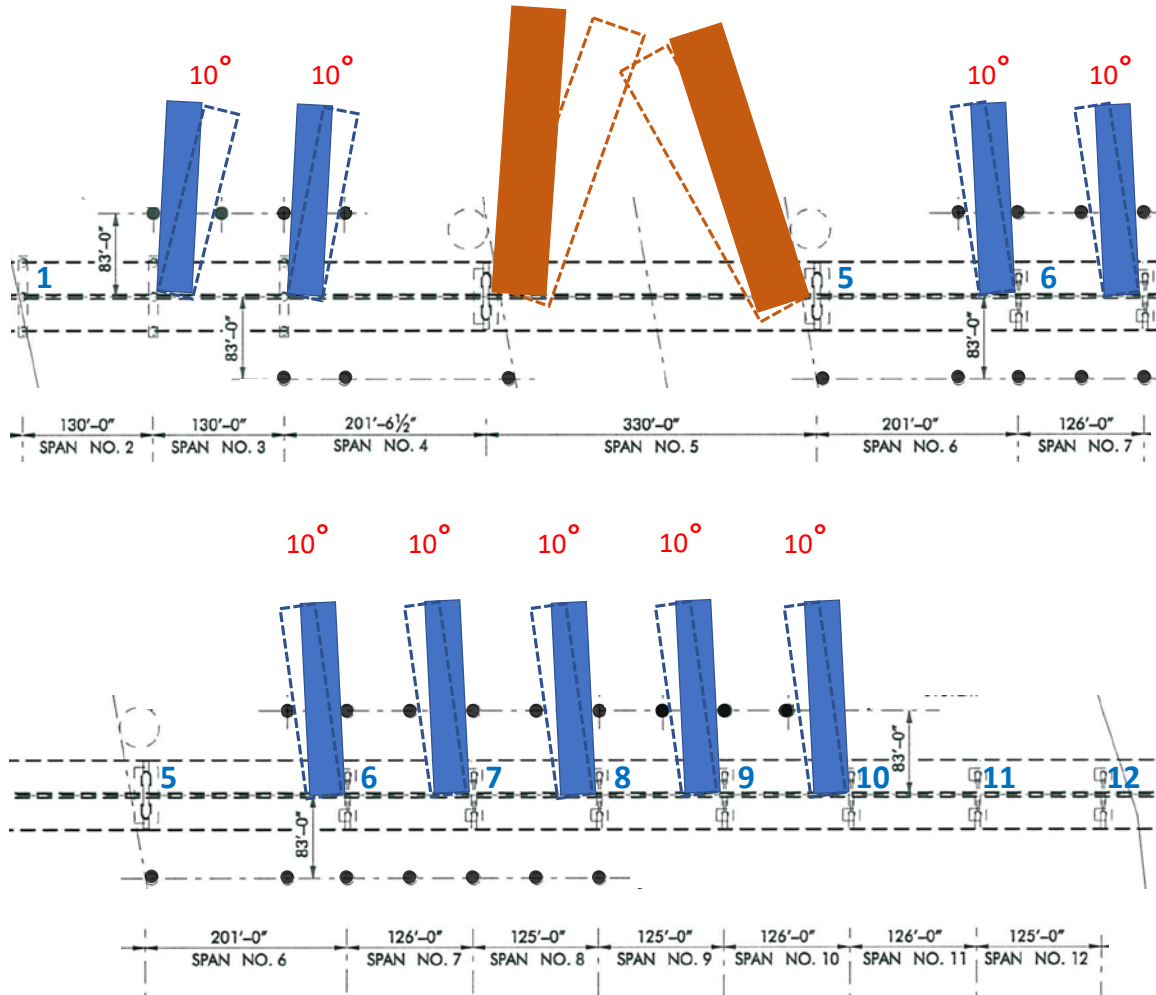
Accessibility of Hopper and Tanker Barges to the Existing Piers for Downstream Traffic Direction
